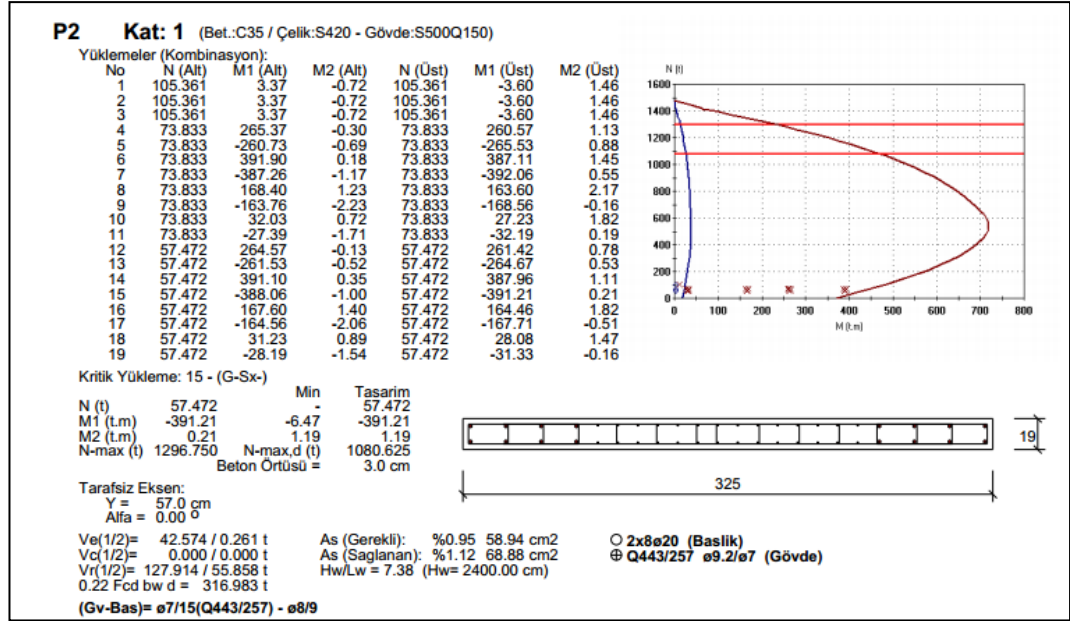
Reinforcement Calculation Summary for a Typical Rectangular Wall
